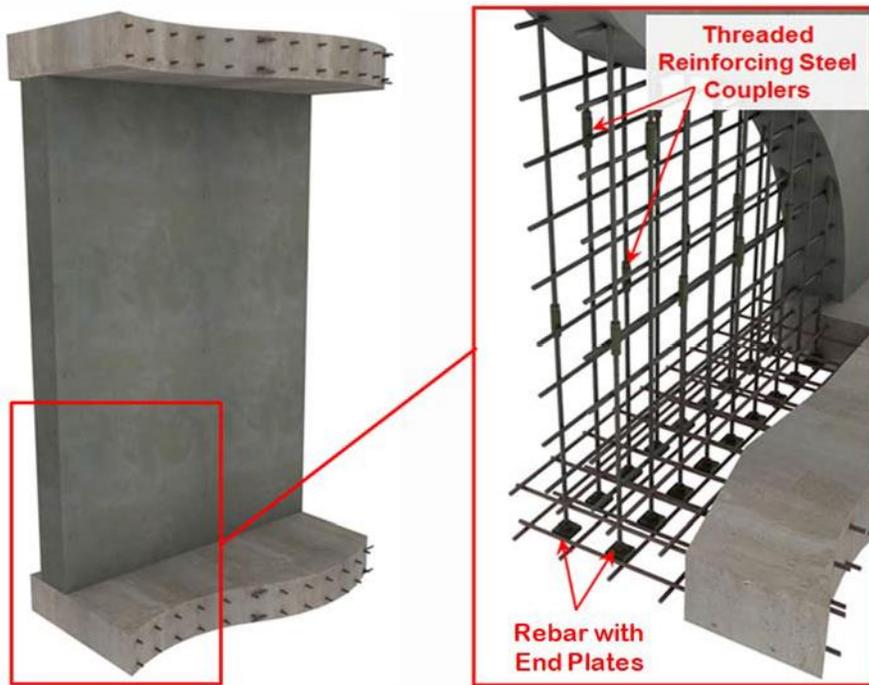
RC wall with threaded reinforcing steel couplers and rebar with end plates
